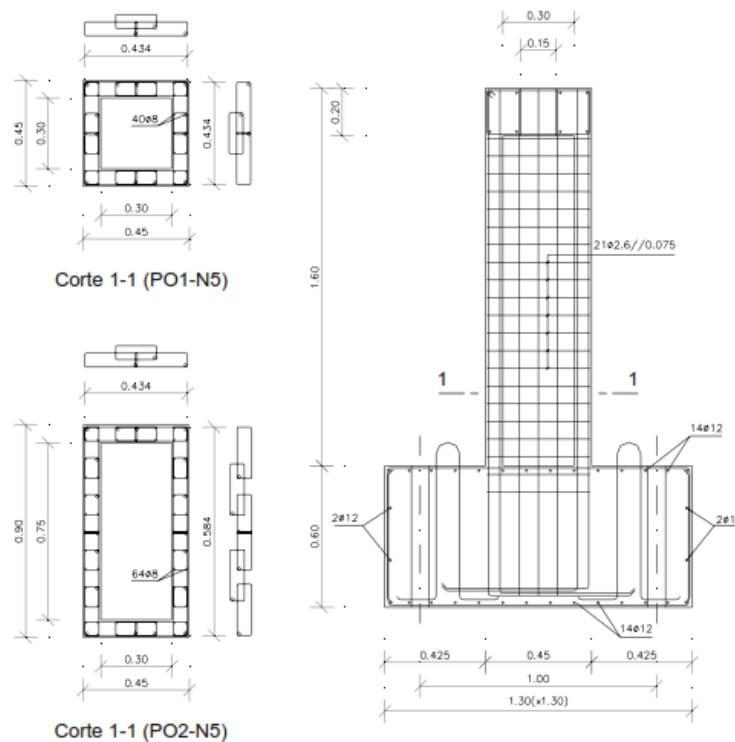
Piers PO1-N5 and PO2-N5 reinforcement details [1].
